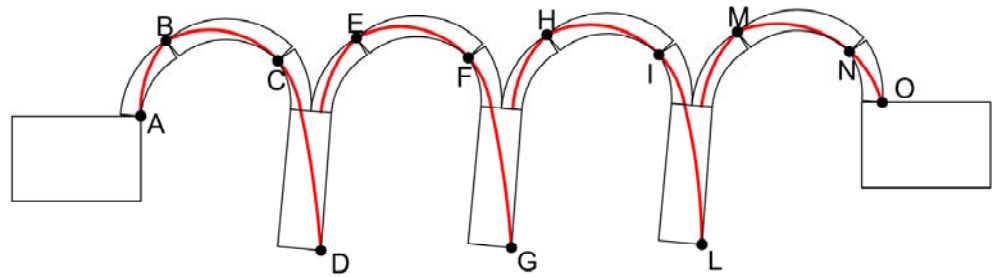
Multi-span bridges: overall collapse mechanism in longitudinal direction (AP-L).
